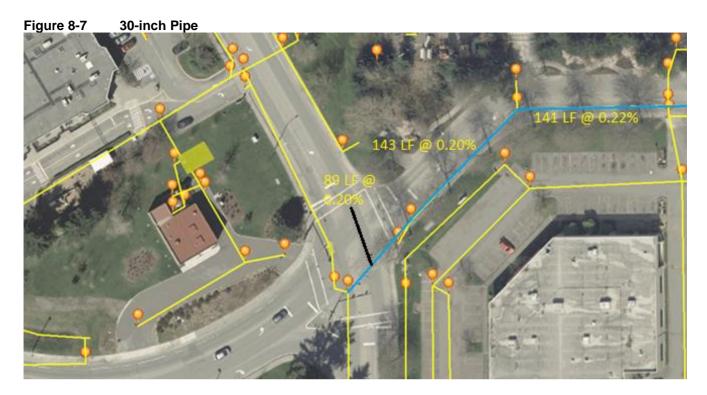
is a continuation of the stormwater sewer section consisting of 30-inch pipe. This section of storm sewer drains a catch basin at the intersection of NE 76th St and 178th PI NE in addition to drainage conveyed from 180th Ave NE.
